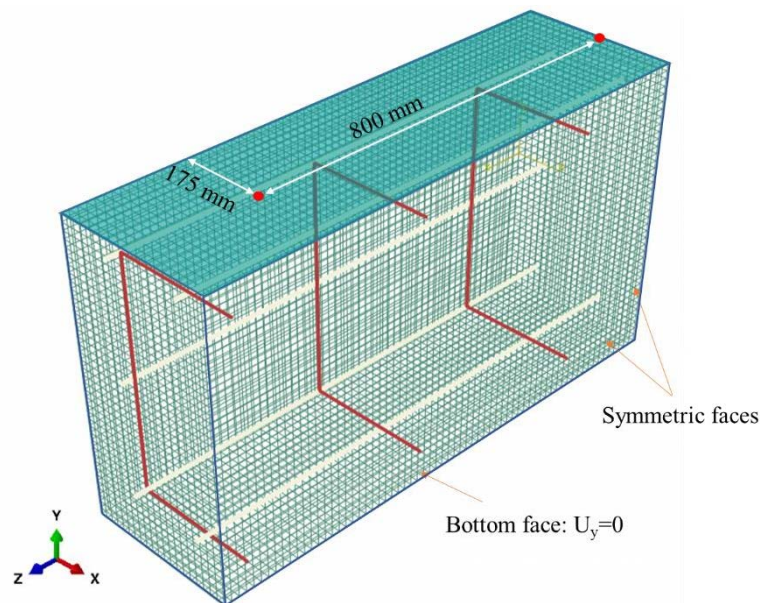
Geometry and boundary conditions of reinforced concrete prism.
